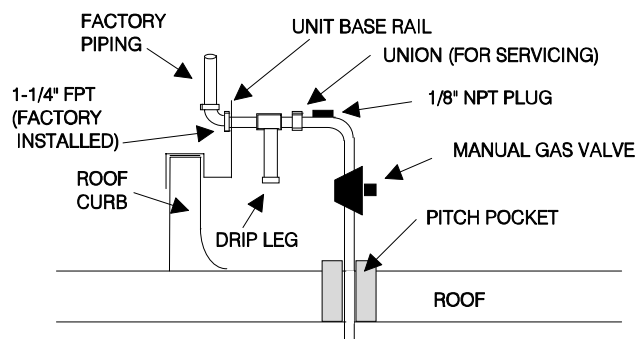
TYPICAL GAS PIPING CONNECTION
